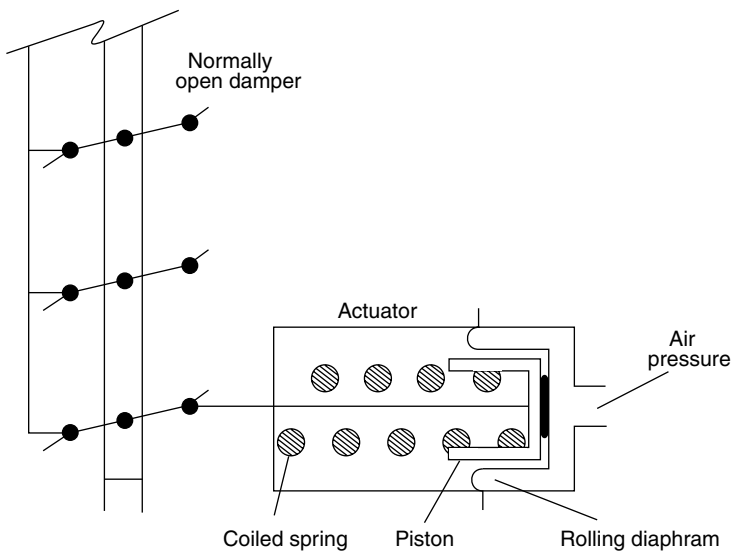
Pneumatic damper actuator. Increasing pressure closes the parallel blade damper.
